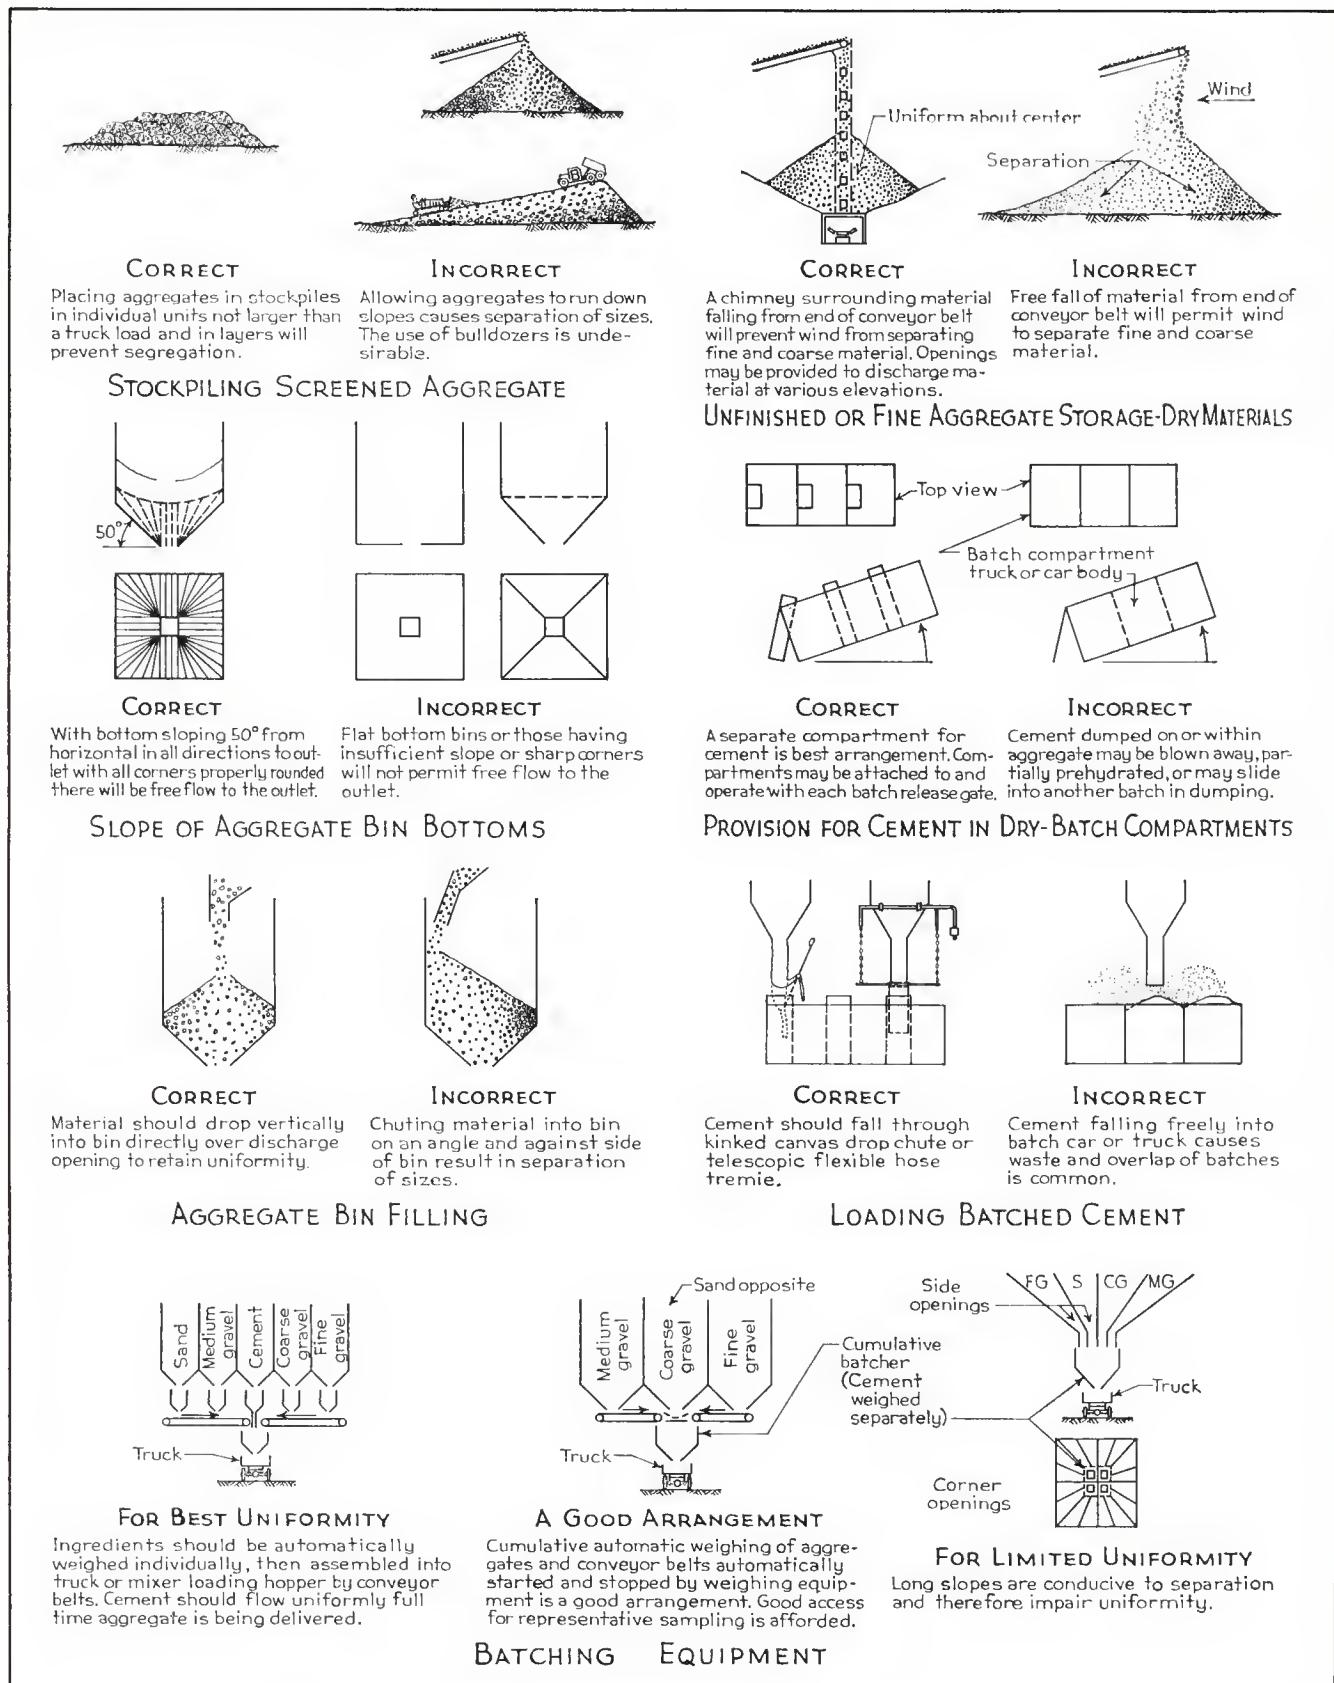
Correct and incorrect methods of handling and storing aggregates. Adapted from Recommended Practice for Measuring, Mixing and Placing Concrete (ACI 614-42) of the American Concrete Institute.
